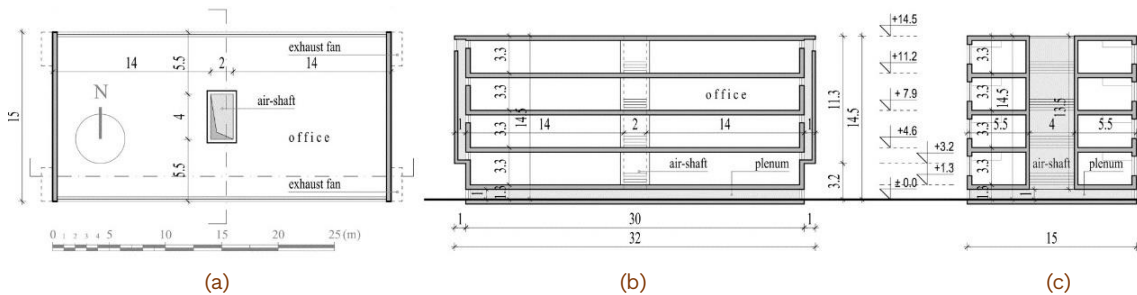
Schematic presentation—concept of building model *D-Fence*—fan-assisted advanced natural ventilation (ANV): (a) longitudinal section; (b) extrapolated typical office floor with a ground-floor plenum: longitudinal section (above) and floor plan (below)
